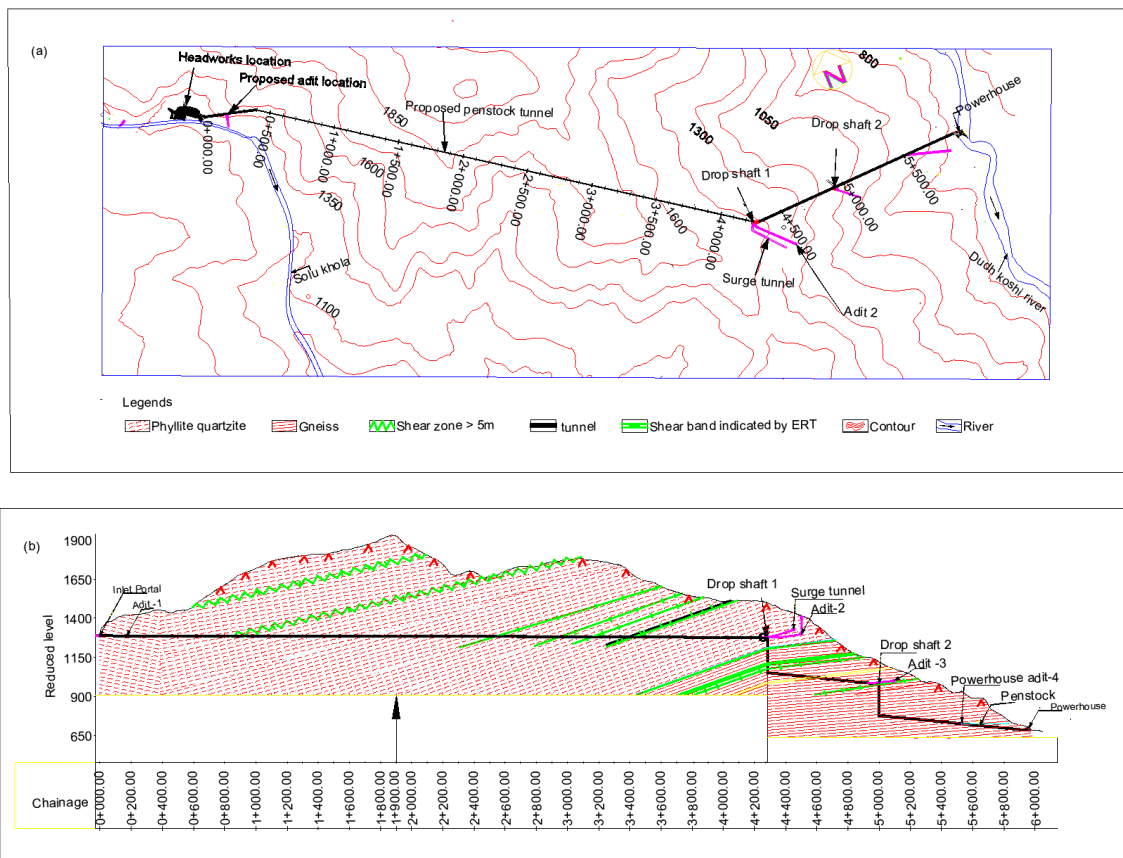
a) Layout and b) Longitudinal section of existing Headrace Tunnel (Original), Not to scale
